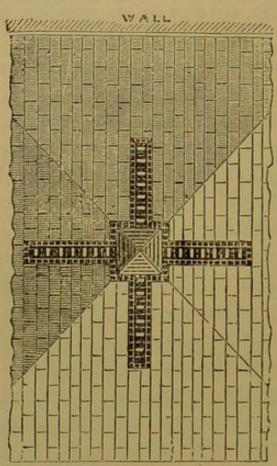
Subsoil drainage of Box or Stall with a Trap in the centre (Musgrave).
